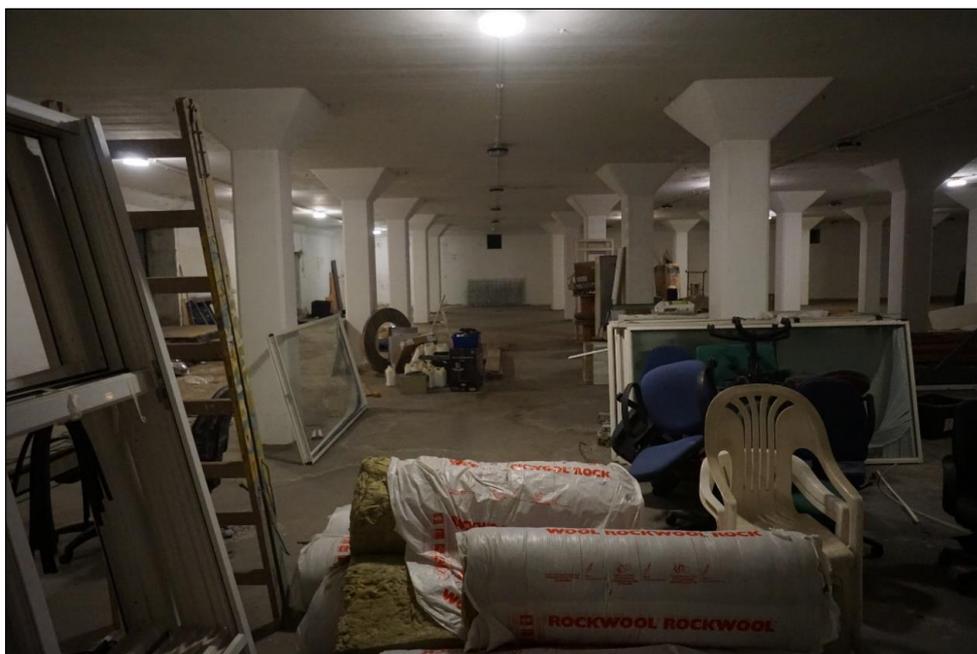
Storage room facing east, with 1m scale. Note the square ventilation aperture on the eastern wall
